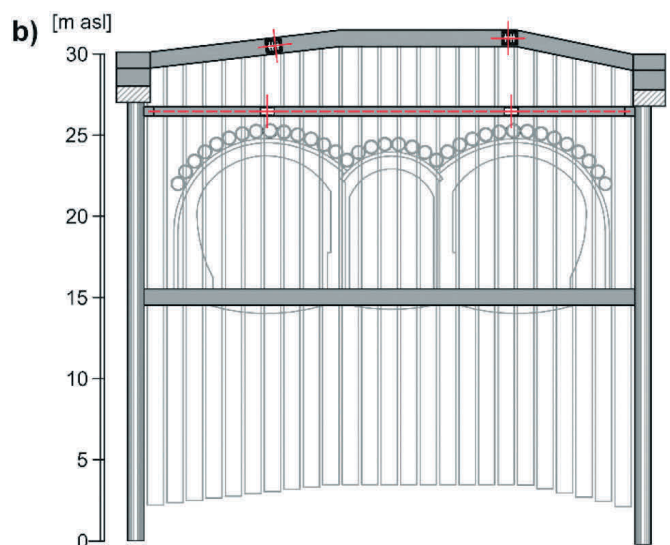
Atrium excavations: a) plan view of supporting pile-walls; b) north section (tunnel entrance).
